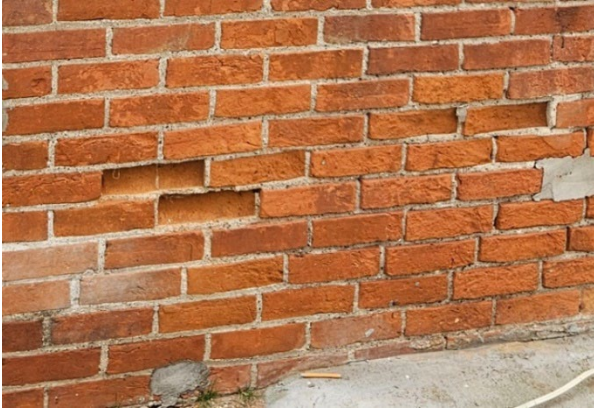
Section loss of brick systematic throughout exterior wall that are shown to be porous included with the mortar subjecting to freeze and thaw.
